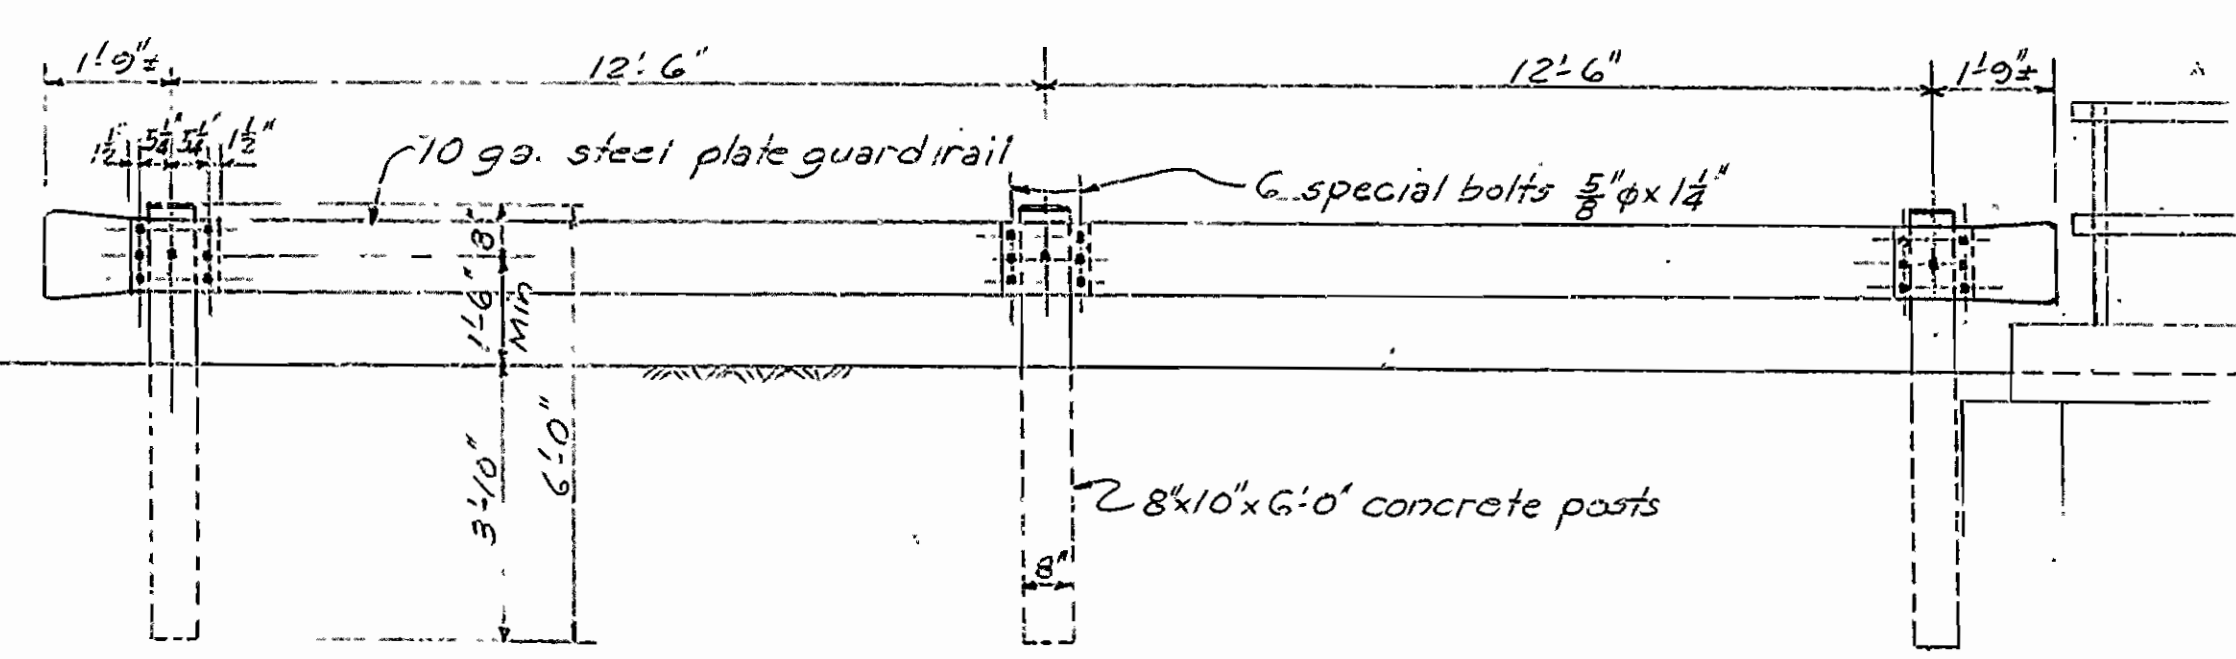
DETAILS OF APPROACH STEEL PLATE GUARD FENCE
